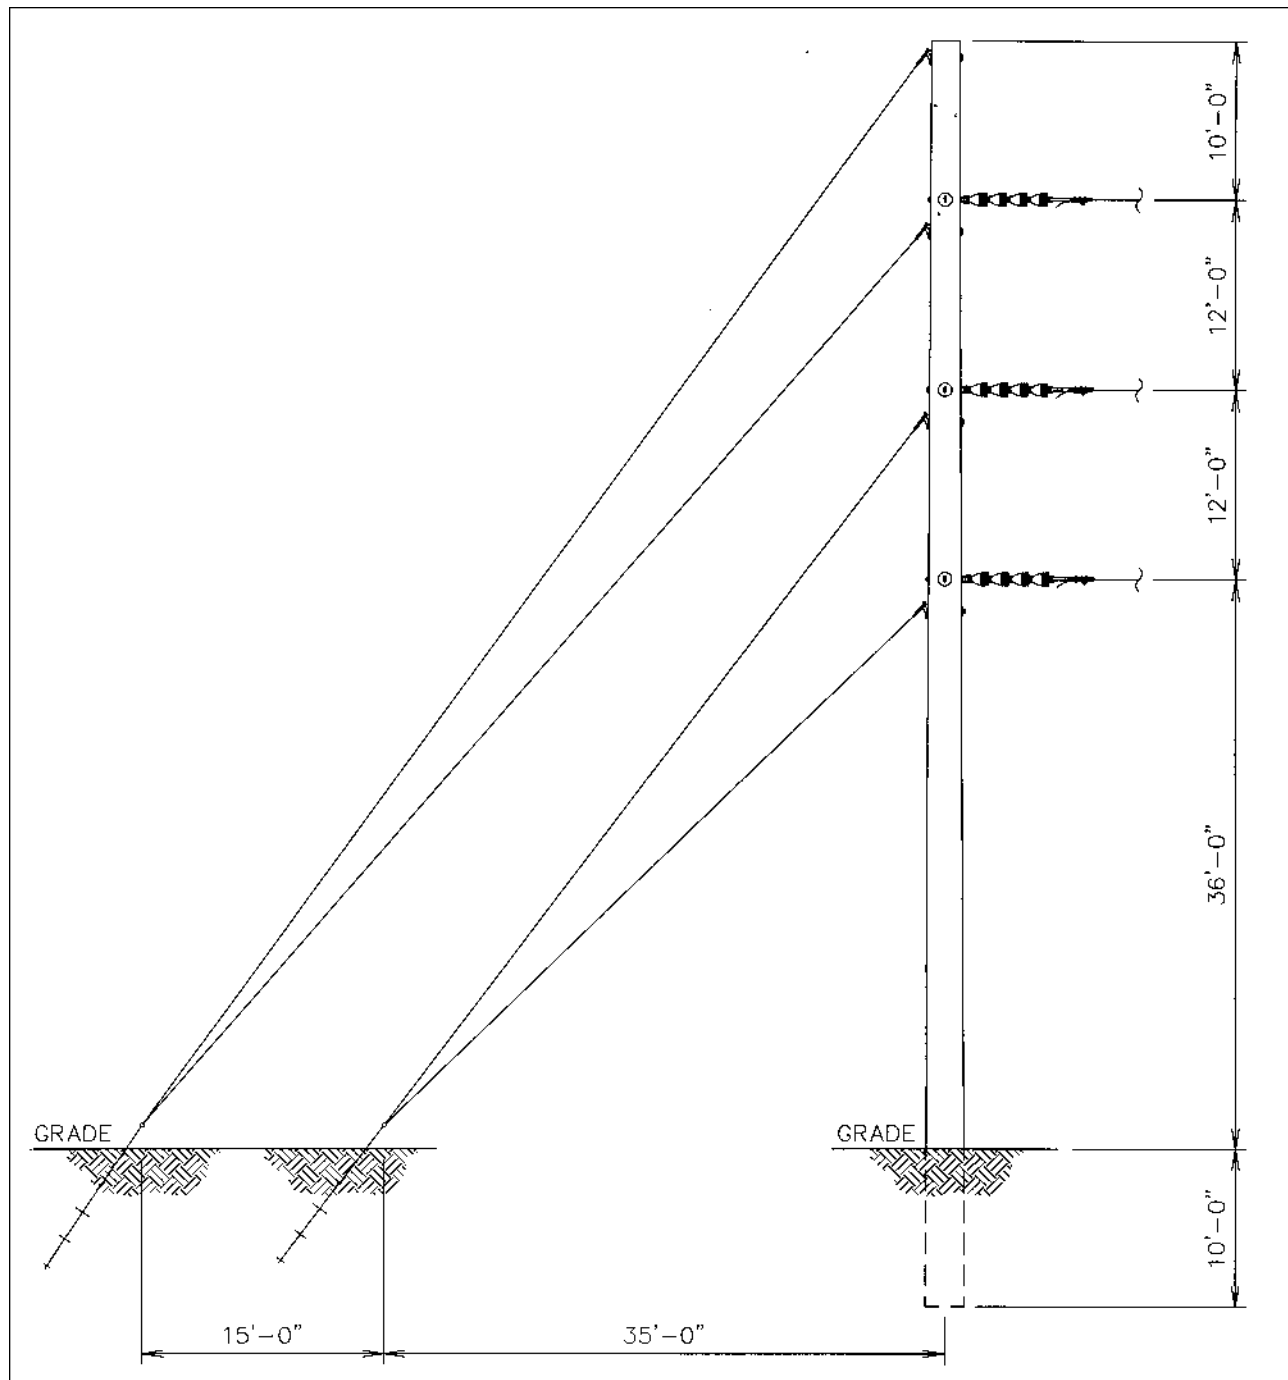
New single-pole 138 kV wood structure on the Scott Road Site
